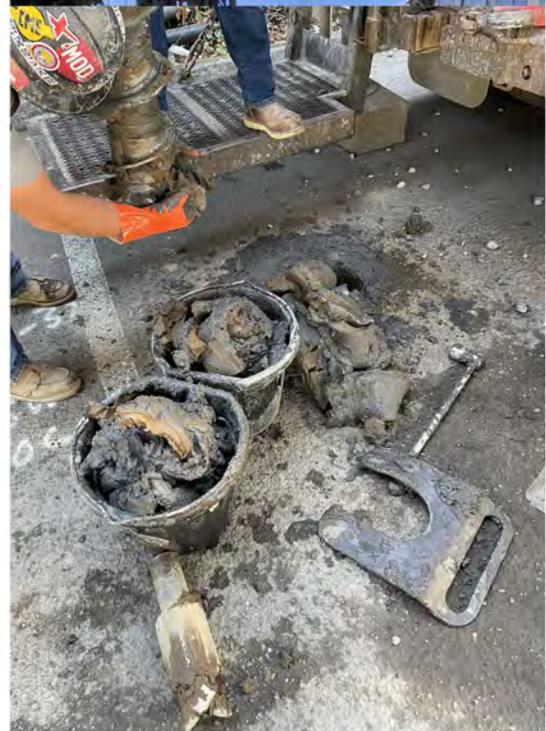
View of petroleum-contaminated soils at boring B-33.
